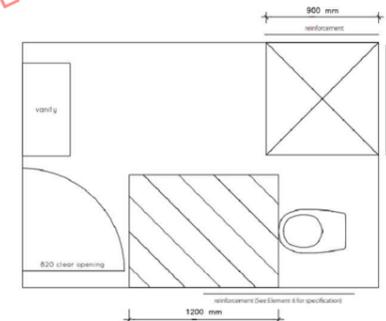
(b) Silver level ground (or entry) level toilet layout and space requirements in a combined bathroom.
